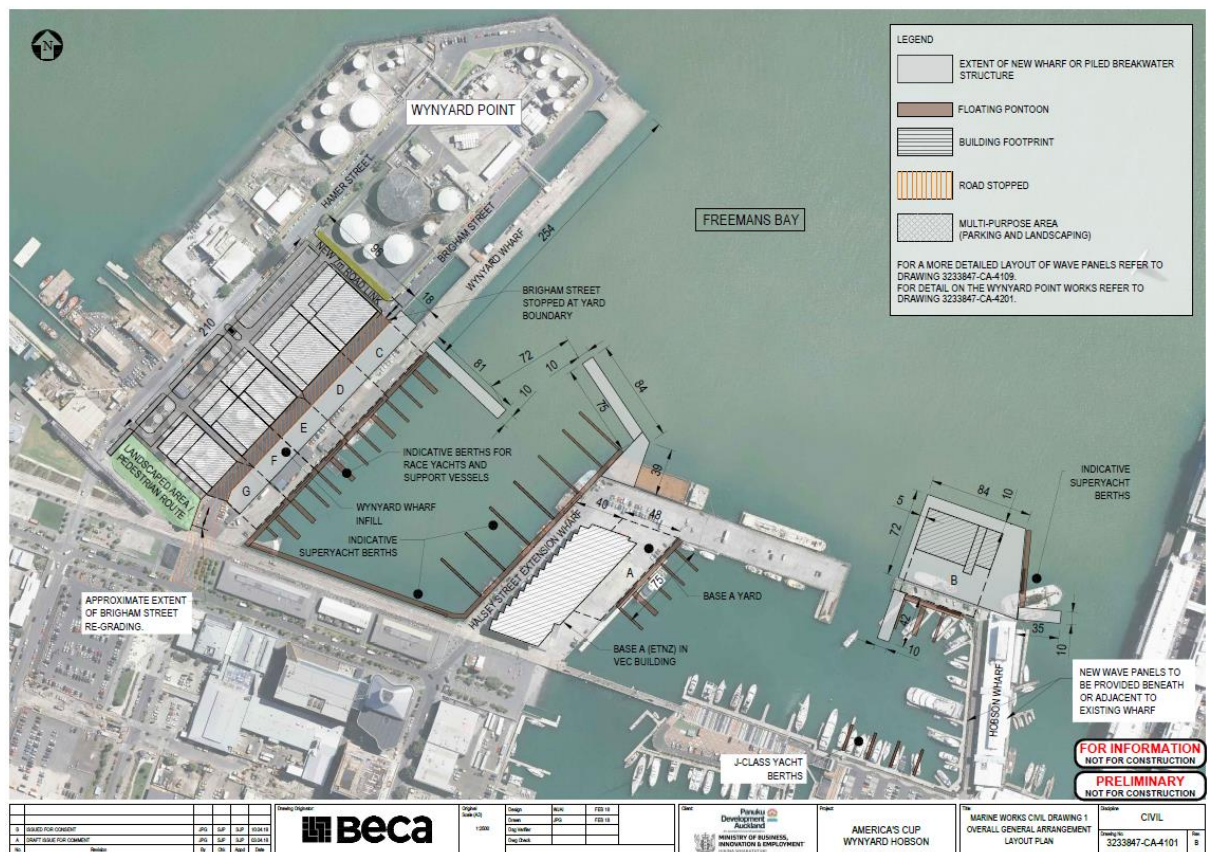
Reproduction of the Layout Plan (from DS5.1)
